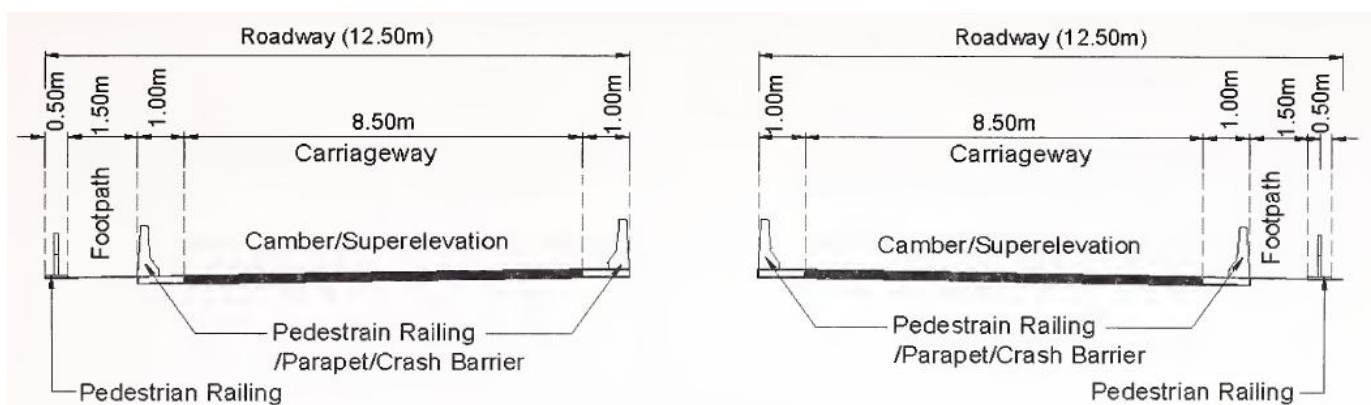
Cross Section of Bridge at Deck Level – with Footpath 4-Lane Divided Highway
